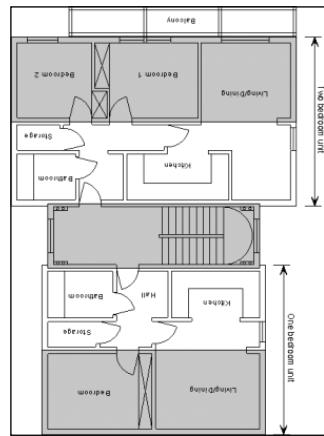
Layout of apartments using partially open sided modules—alternate modules are shaded
